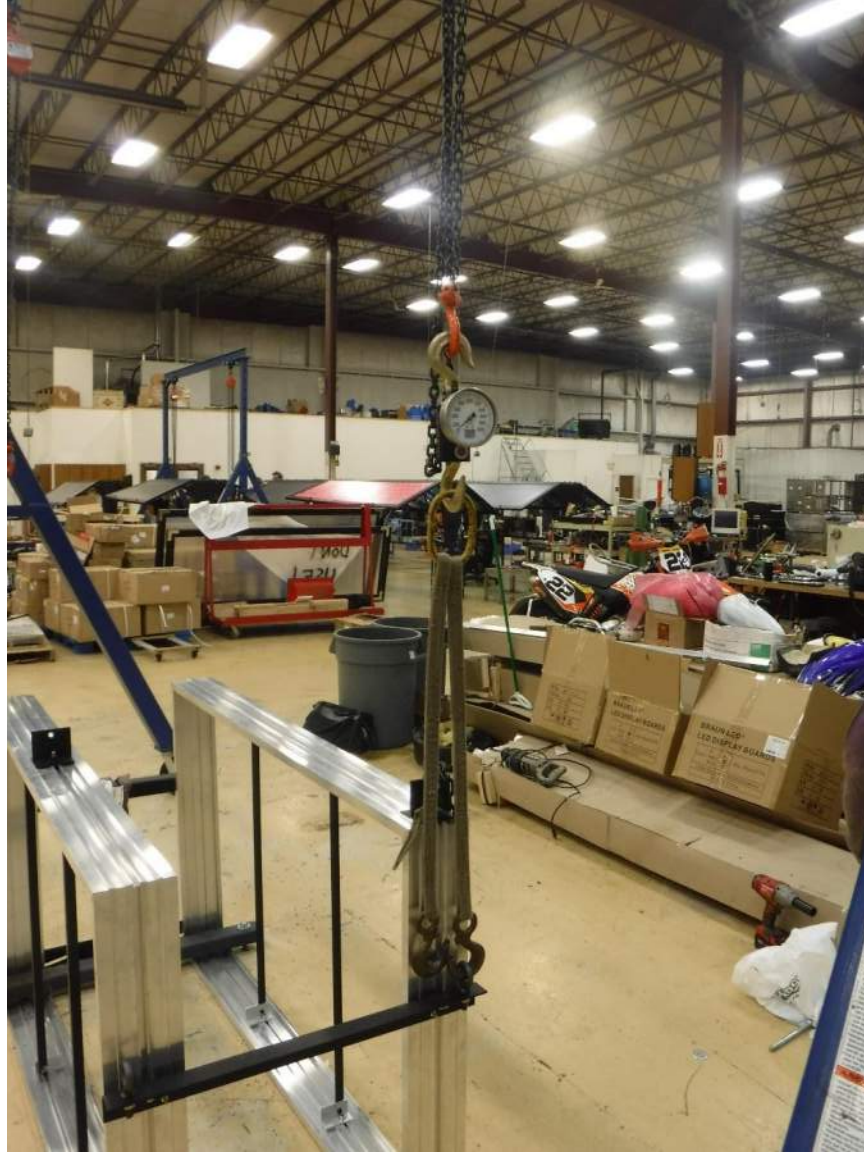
Test LT-5, Side Angle Test 3 [1100 LBS]
